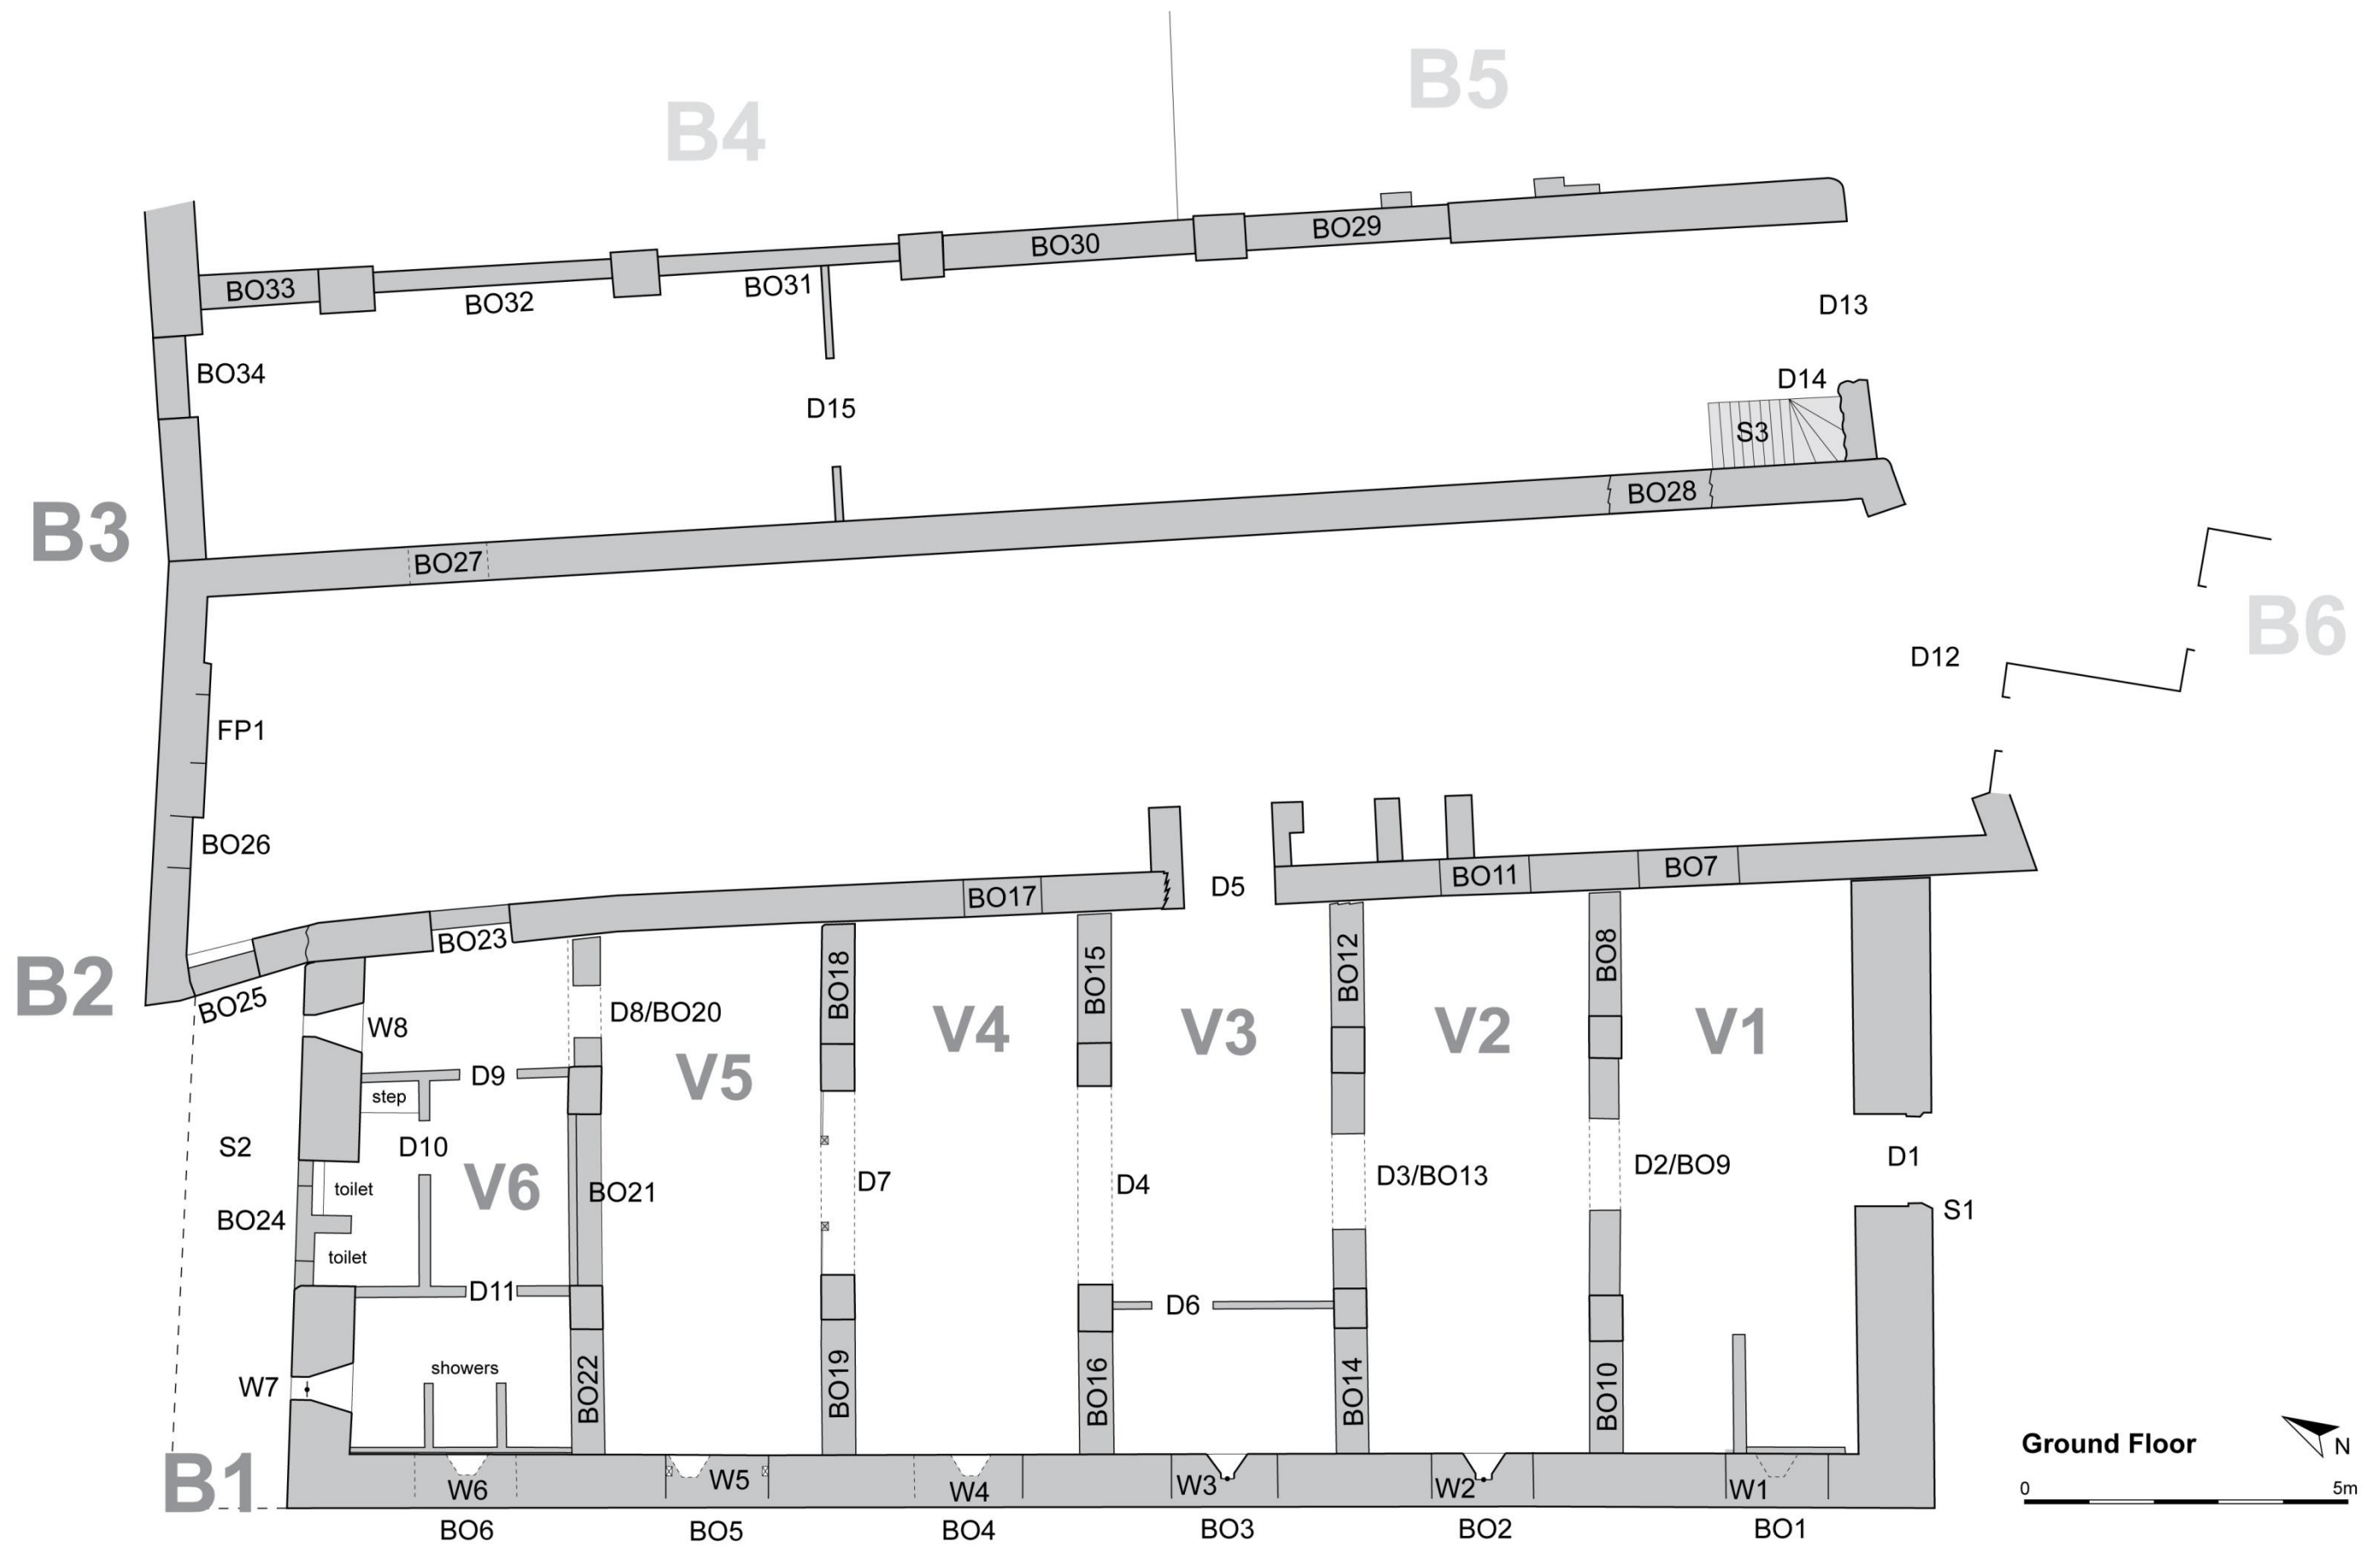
GROUND-FLOOR PLAN OF B1-B3 SHOWING DOORS (Dx), WINDOWS (Wx), FIRE PLACES (FPx), BLOCKED OPENINGS (BOx) AND SIGNIFICANT FEATURES (Sx).
